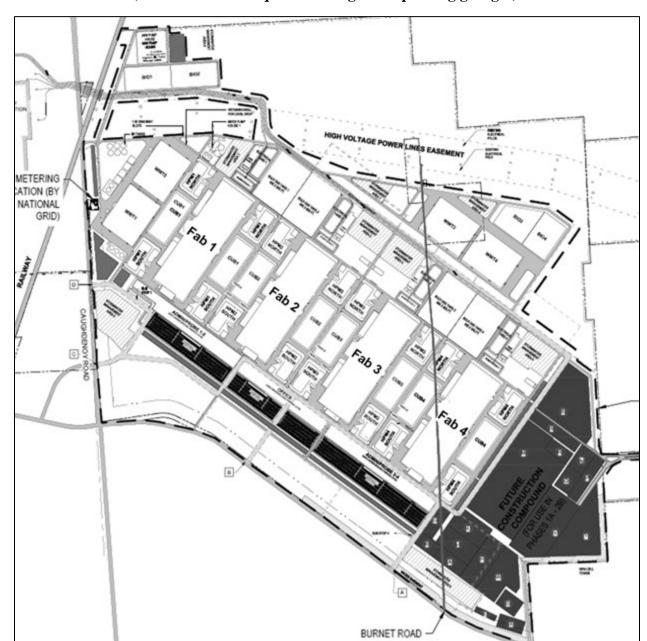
Site Layout Alternative 2 (similar to 1 but requires underground parking garages)
